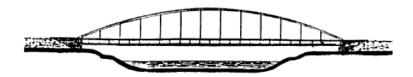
Steel tied arch bridge, (Chen et al., 2000)
